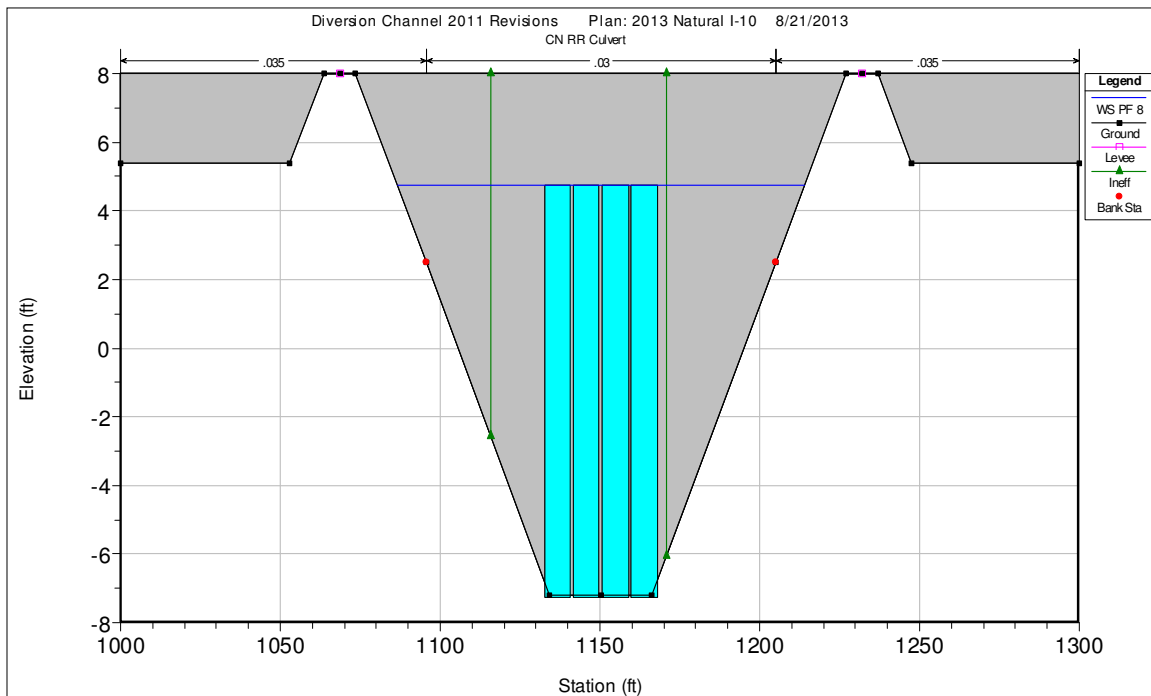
A four barrel 8-ft x 12-ft box culvert arrangement is used at the CN RR crossing.
